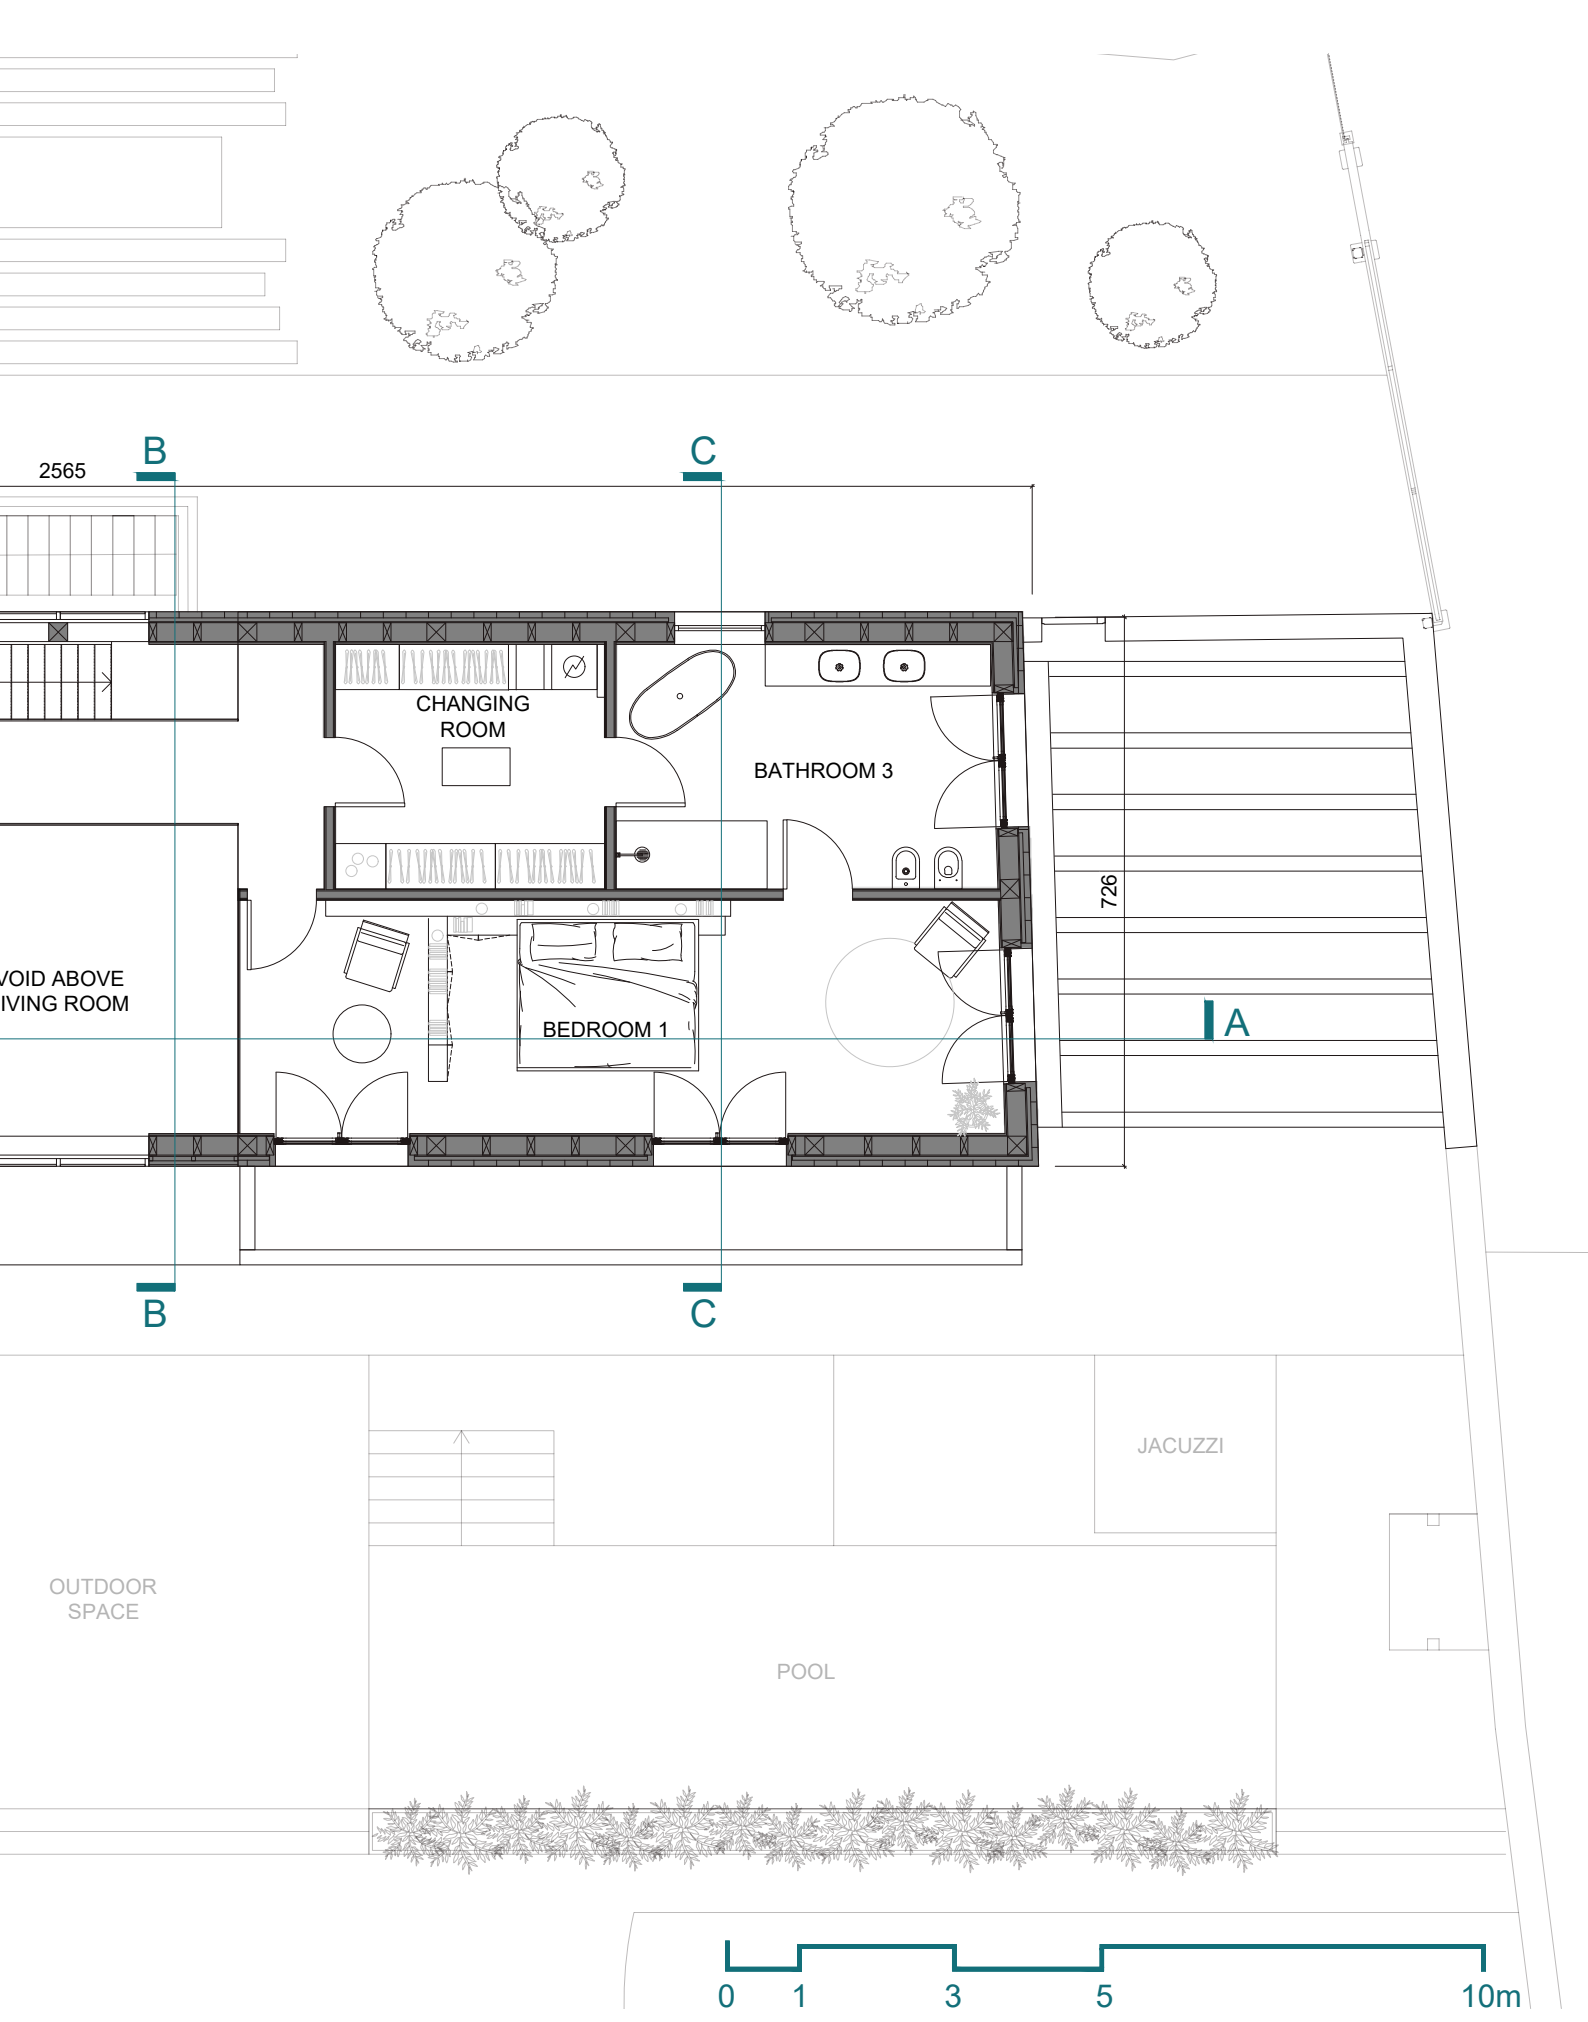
OPTIMIZATION FIRST FLOOR PLAN
